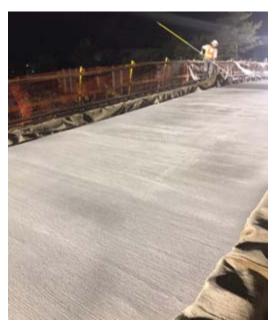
Burlap Placement on the Barrier Reinforcement
